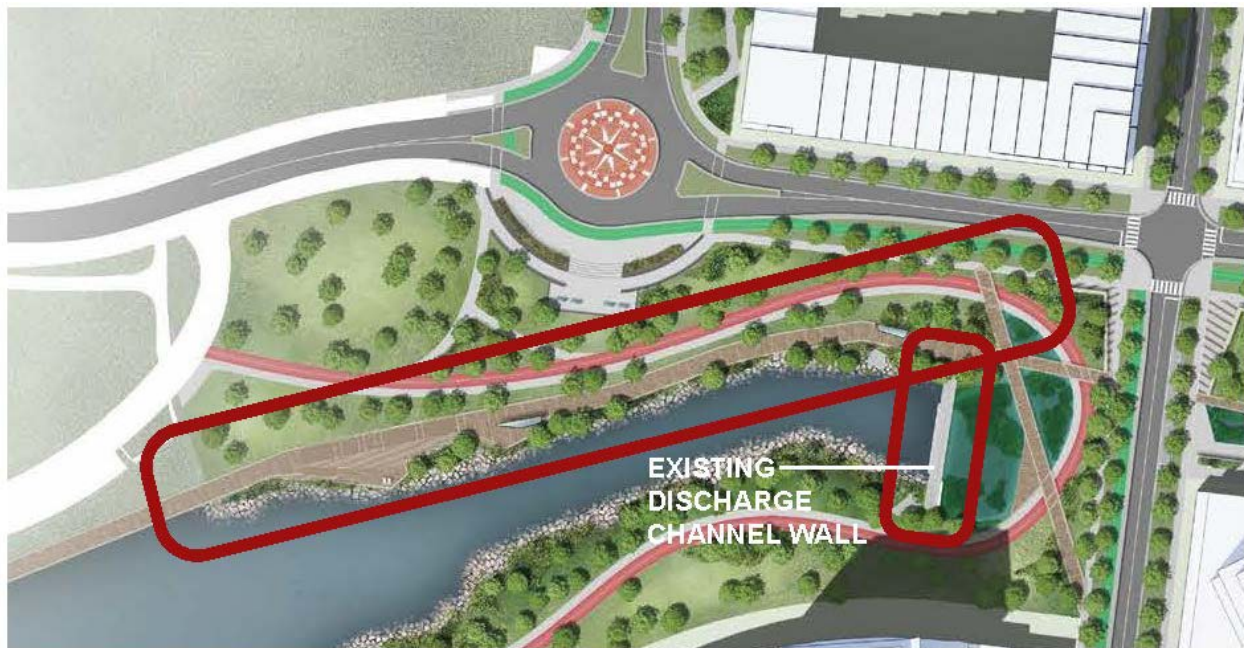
Conceptual plan illustrating the proposed west boardwalk extension and shoreline repair to fill-in decommissioned outlets and provide stable base for the boardwalk construction.
